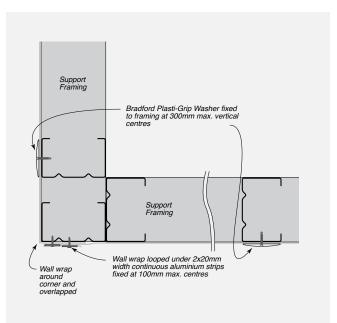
Internal Corner - Wall Wrap Continuous
